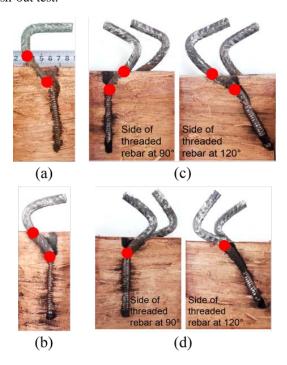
Failure modes of test series: plastic hinges in threaded rebar and embedment of timber; (a) STRI; (b) STRW; (c) XTRI; (d) XTRW
